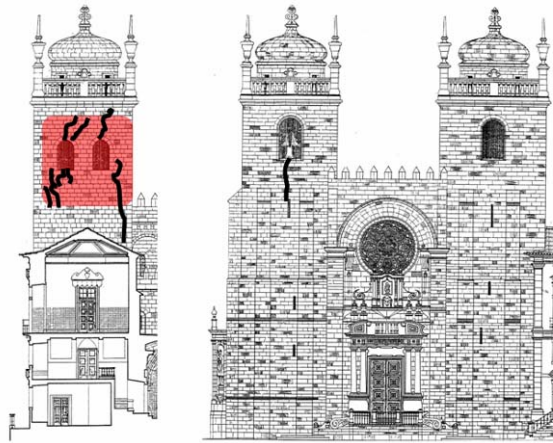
Location of most severe cracks and out-of-plumb walls, in the South view and main façade.
